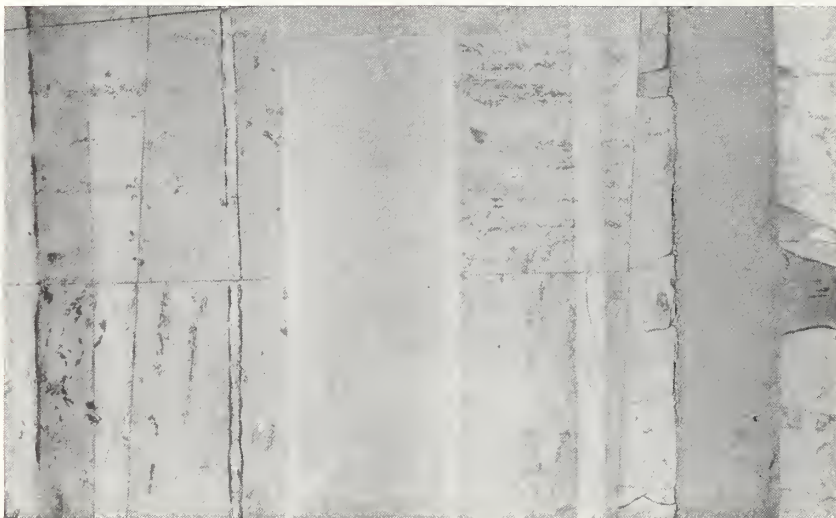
$\frac{1}{8}$ -in. asphalt tile on wood subfloor (test panel 14L).
